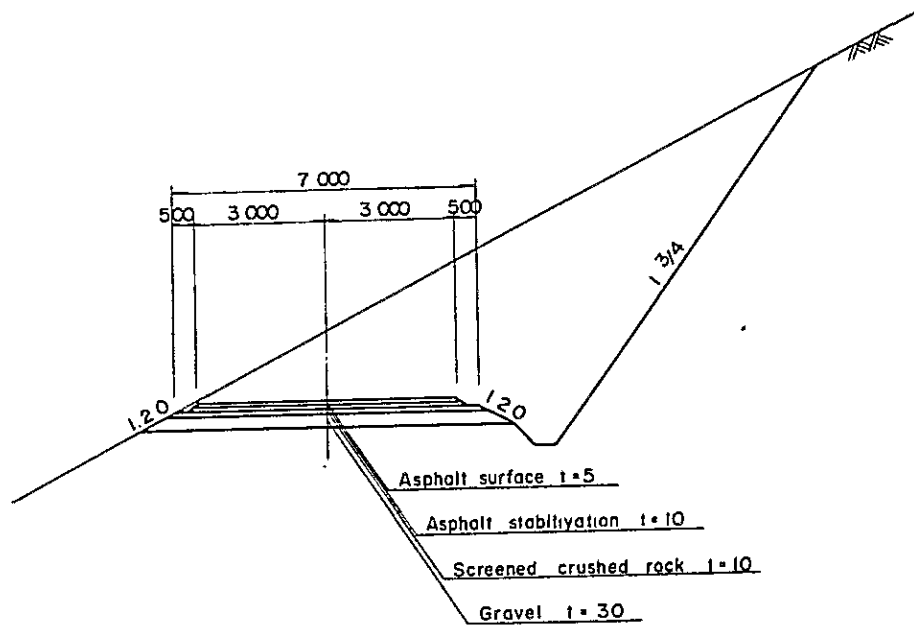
Typical Cross-Section of Llano Grande/Coclesito Section (Asphalt Proposal)
